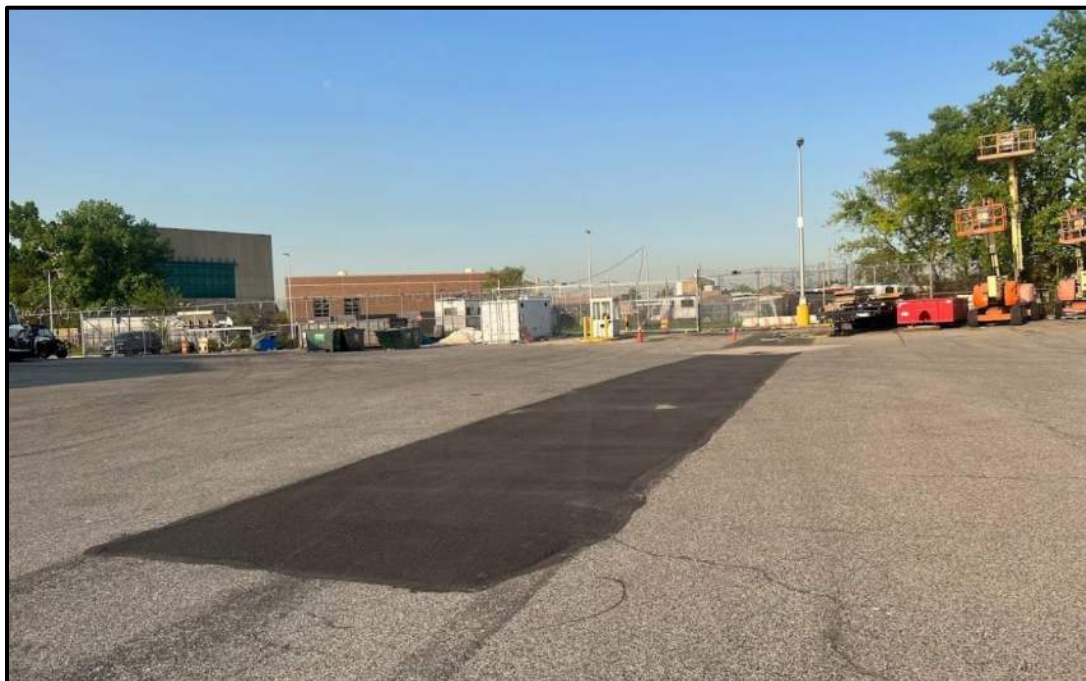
Facing west in the northern portion of Site; shows area asphalt repair completed in August 2022. Asphalt and concrete in good condition.
